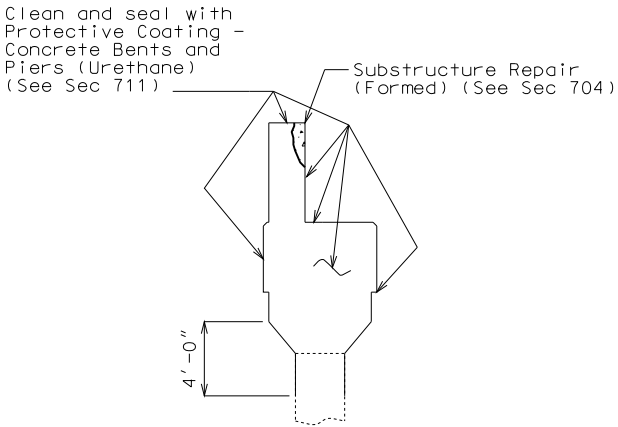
DETAILS OF CONCRETE REMOVAL @ END BENTS NO. 1 & 6
